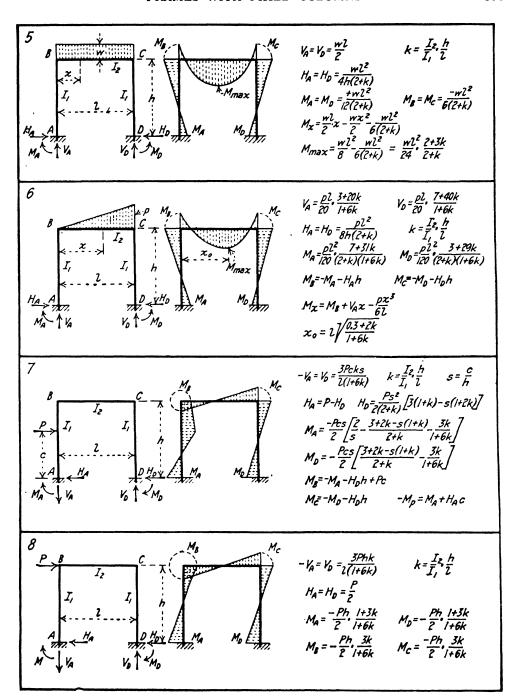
STRESSES IN STIFF FRAMES WITH FIXED COLUMNS.
